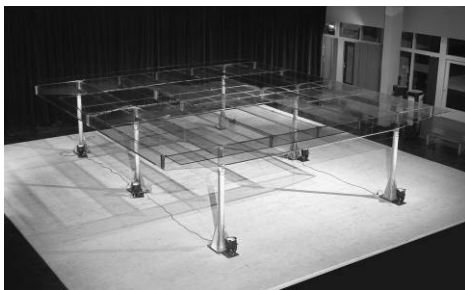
Roof Structure of the All Transparent Pavilion.
